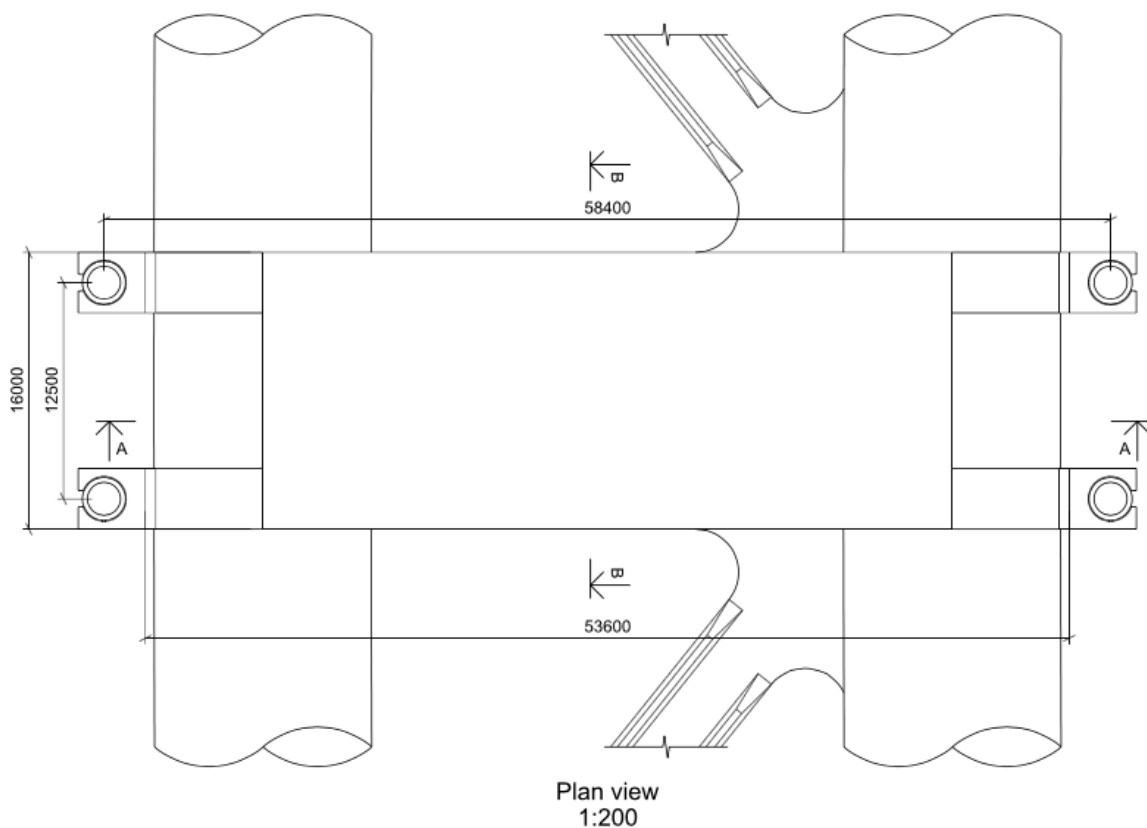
Plan view of the cross tube with tether placings shown for a section without lay-by.
